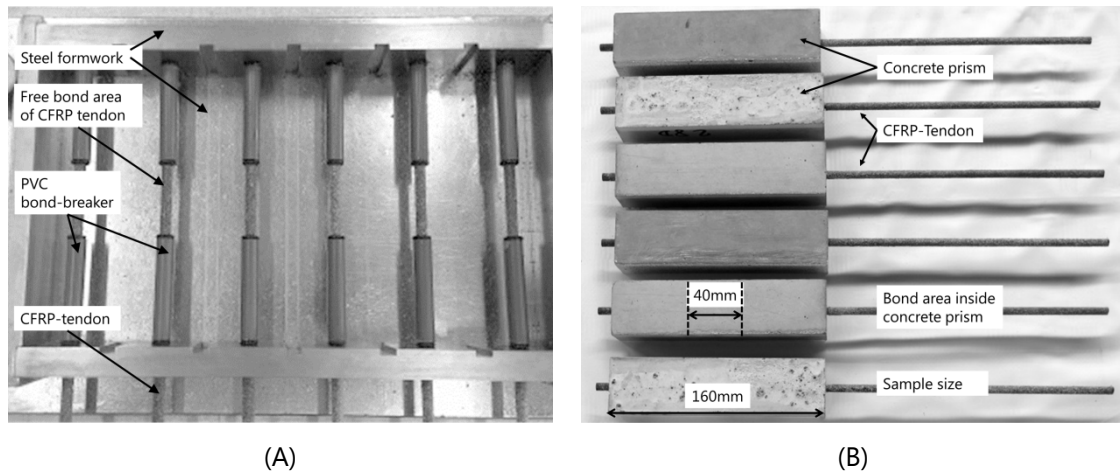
Specimen details: (A) CFRP-tendon and bond-breaker arrangement before casting; and (B) demoulded samples before testing.
